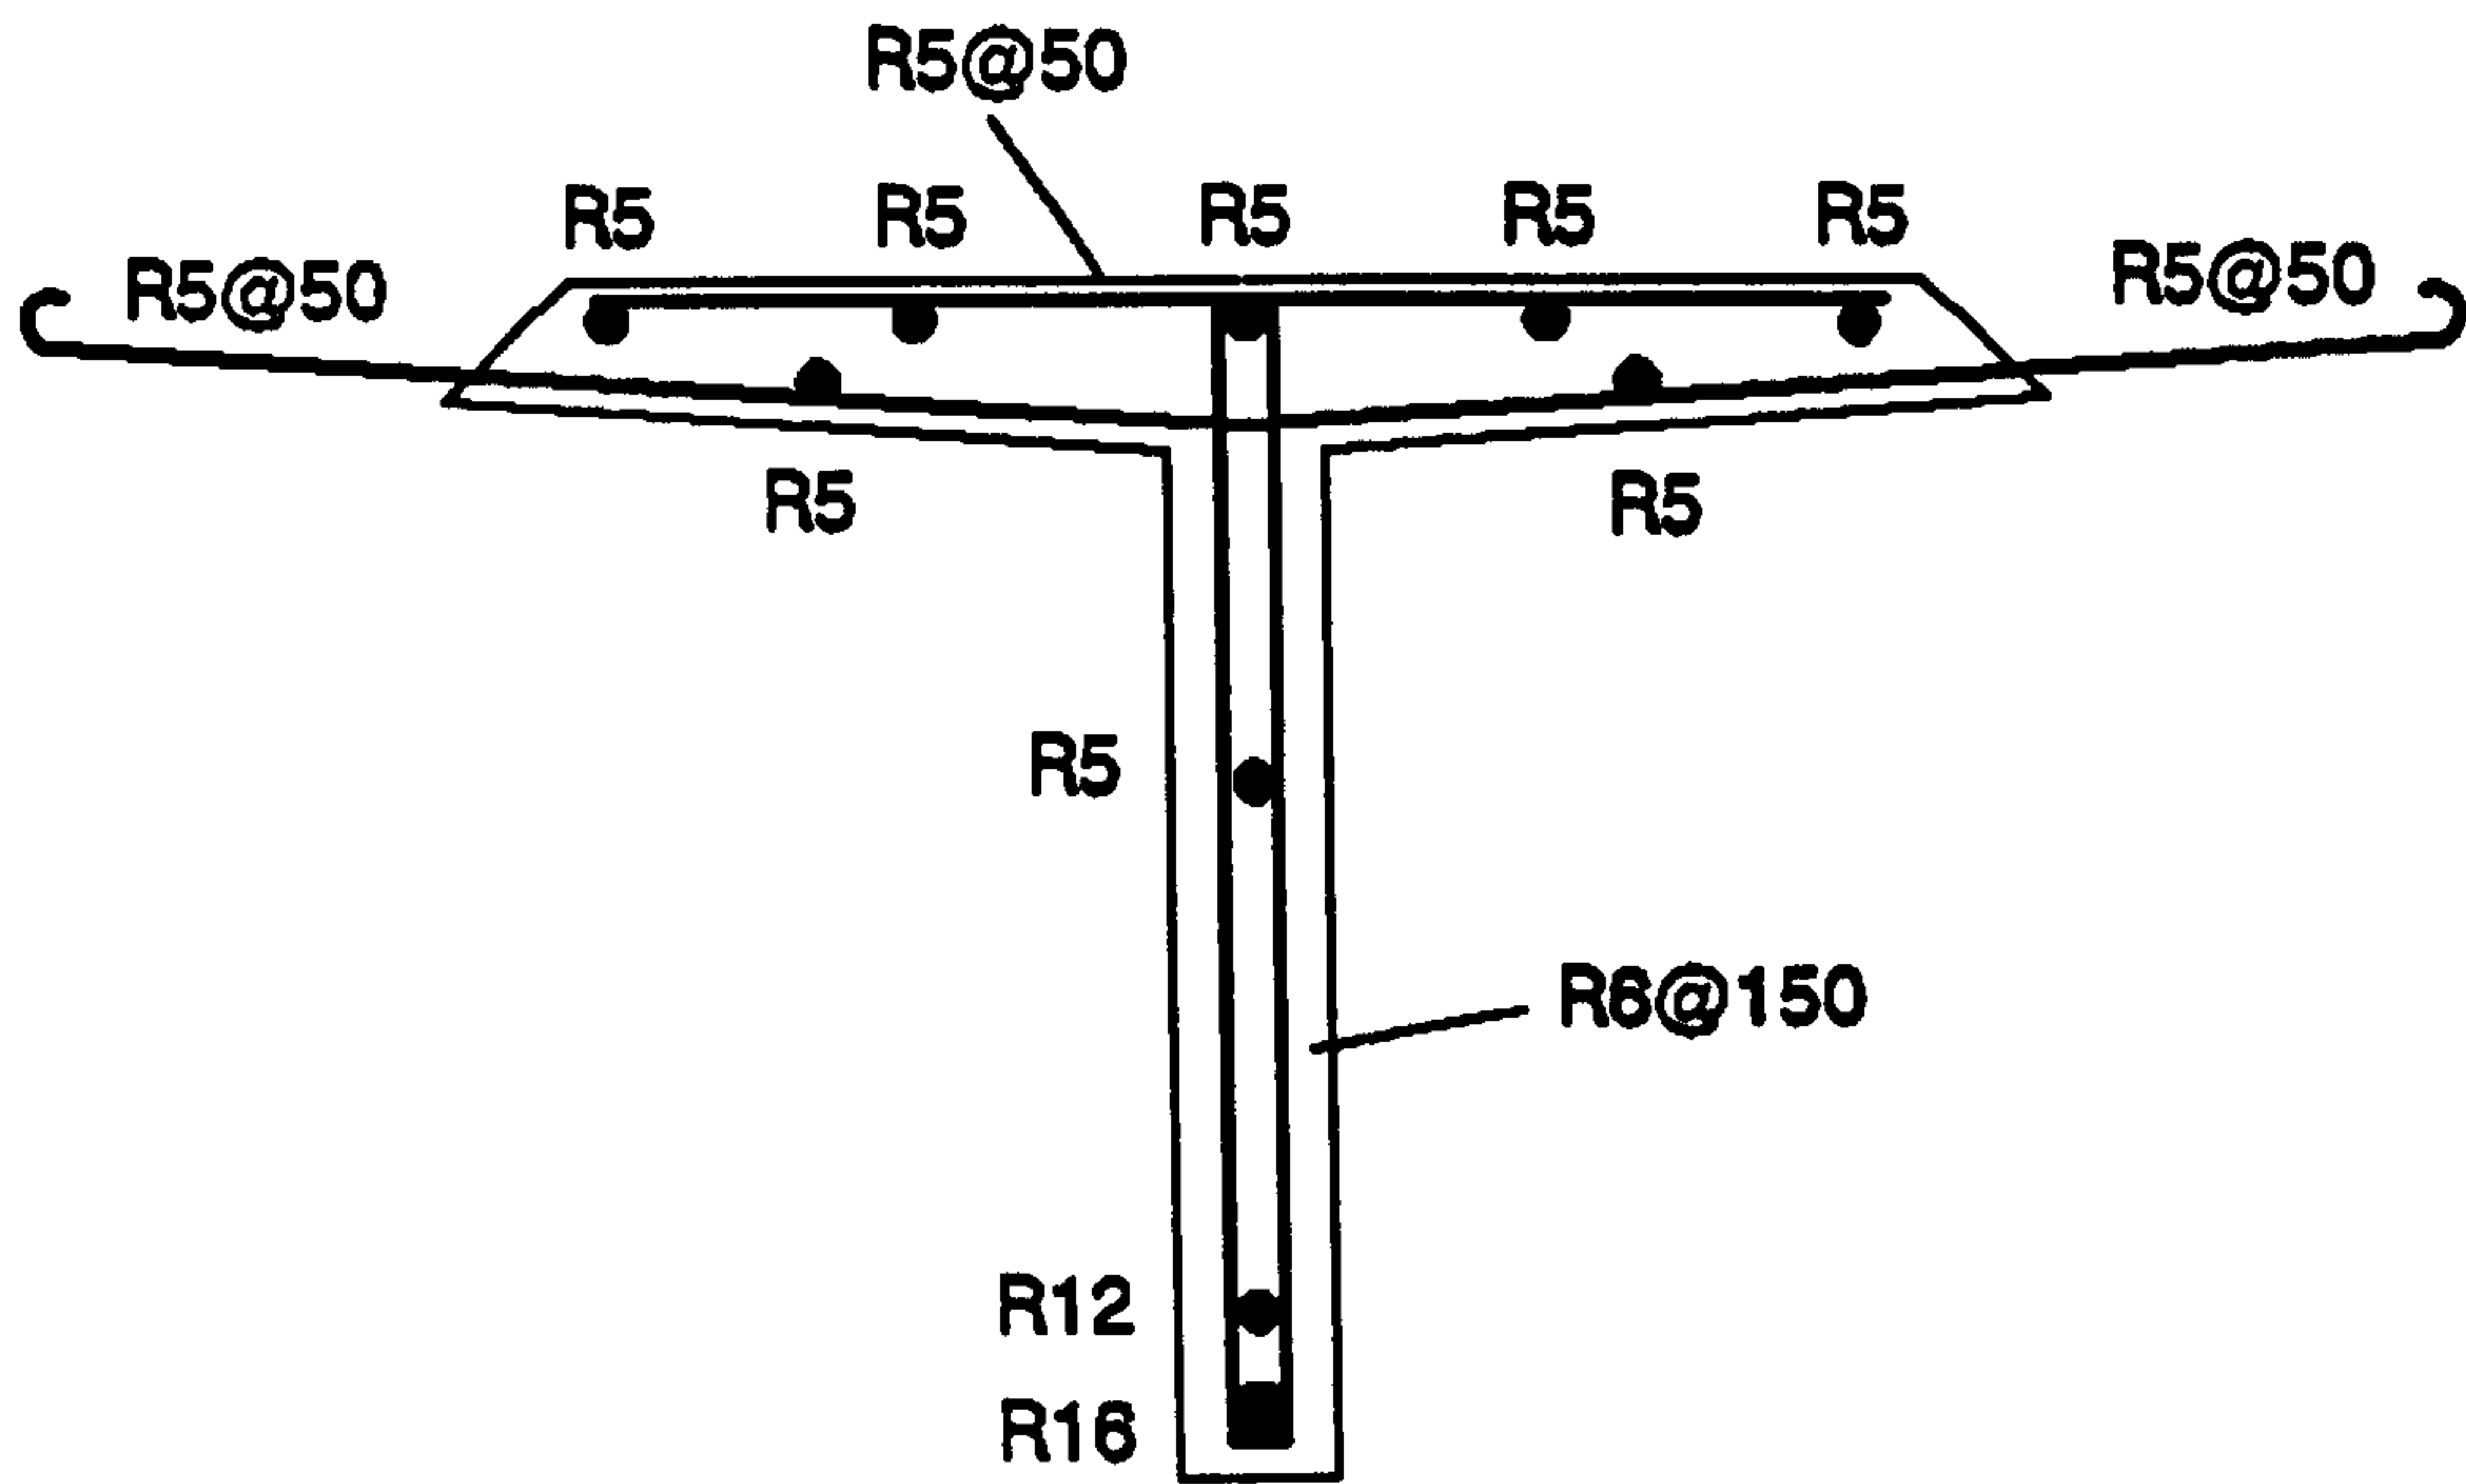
Reinforcement Details of Main Beam in the Model Bridge Deck
